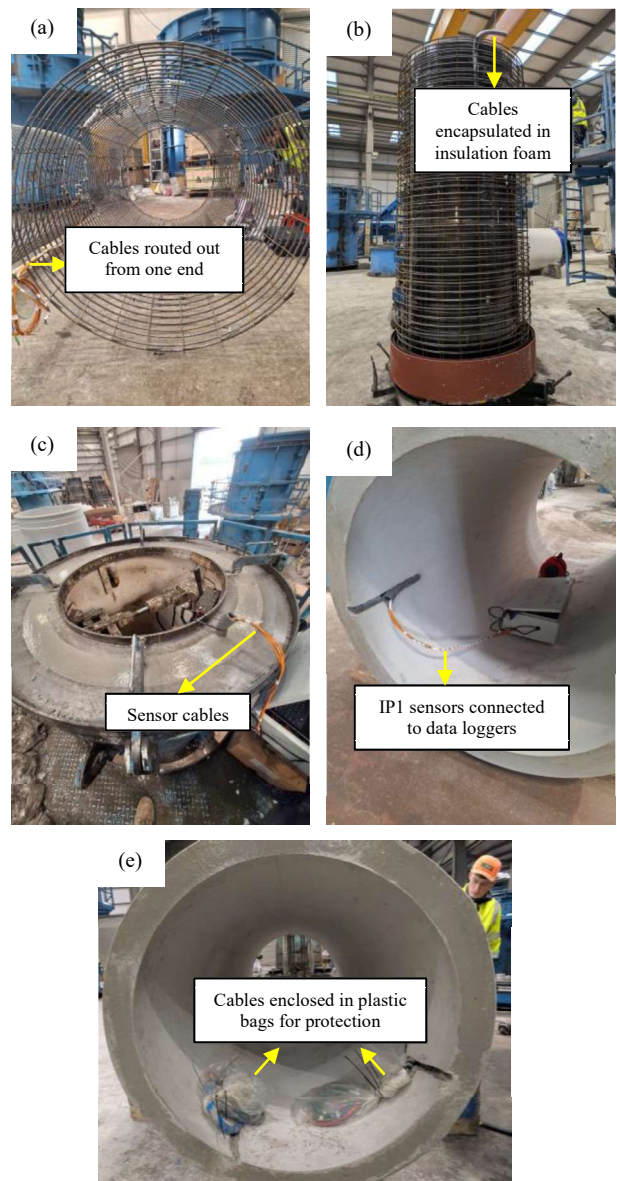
(a) Sensor cables routed out from one end of the pipe, (b) cables wrapped in insulation foam, (c) concrete pour, (d) data logging during concrete curing (IP1), and (e) cables enclosed in plastic bags during concrete curing (IP2).
